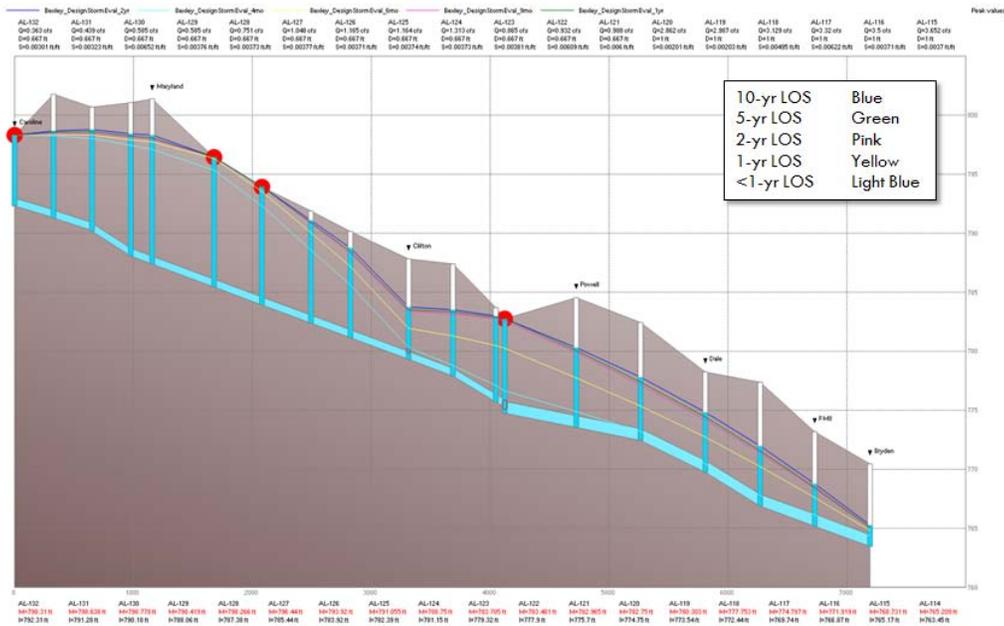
Hydraulic Profile of Parkview Avenue Sewer for Existing Conditions
